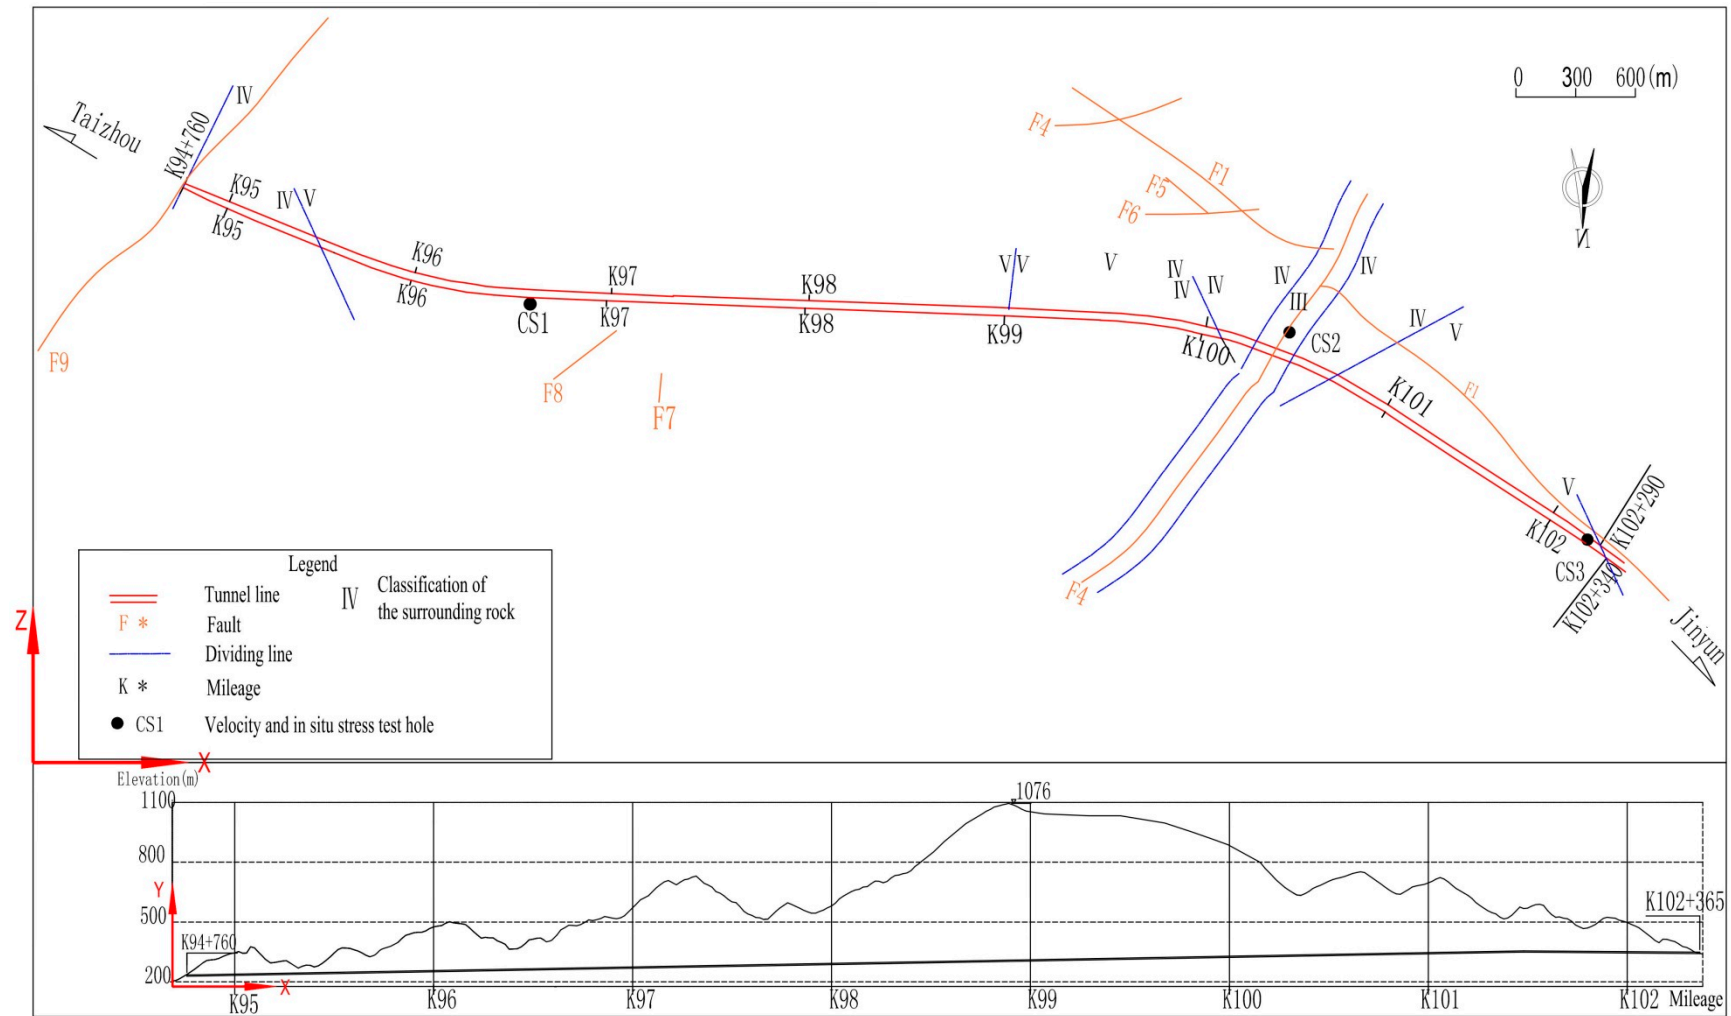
Plane and vertical sectional diagram of Cang Ling Tunnel.
